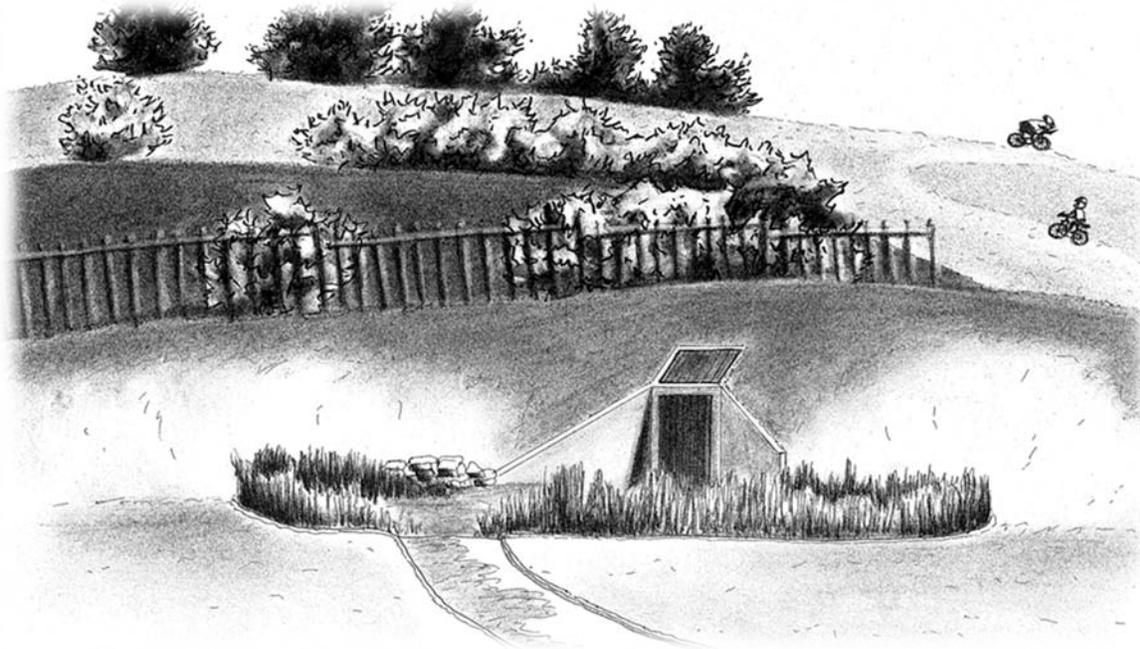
Flared Wall Outlet Structure Configuration. Graphic by Adia Davis.
